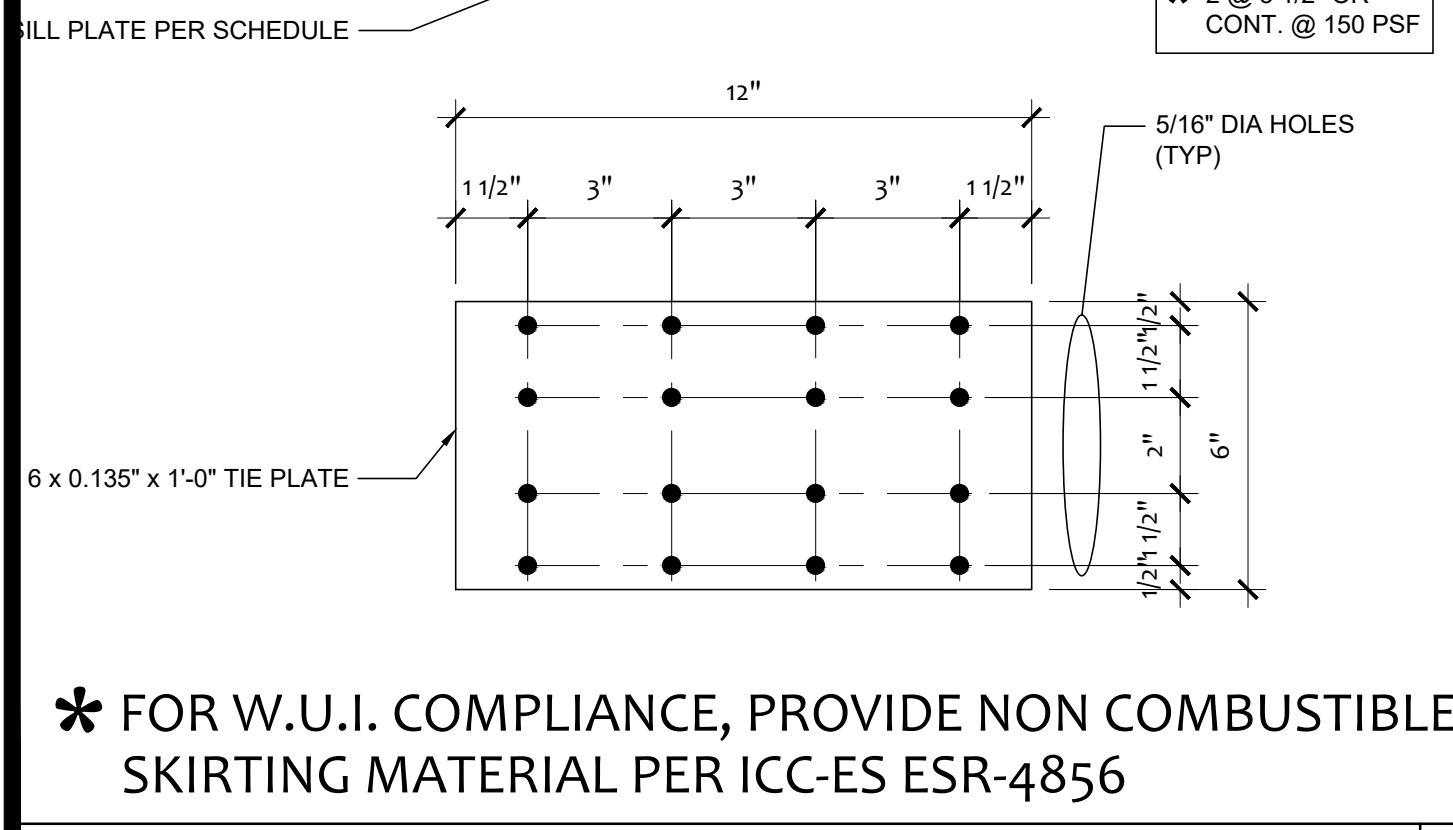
PLATE LAYOUT AT BUILDING PERIMETER SCALE: 1/2"=1'-0" 15A
